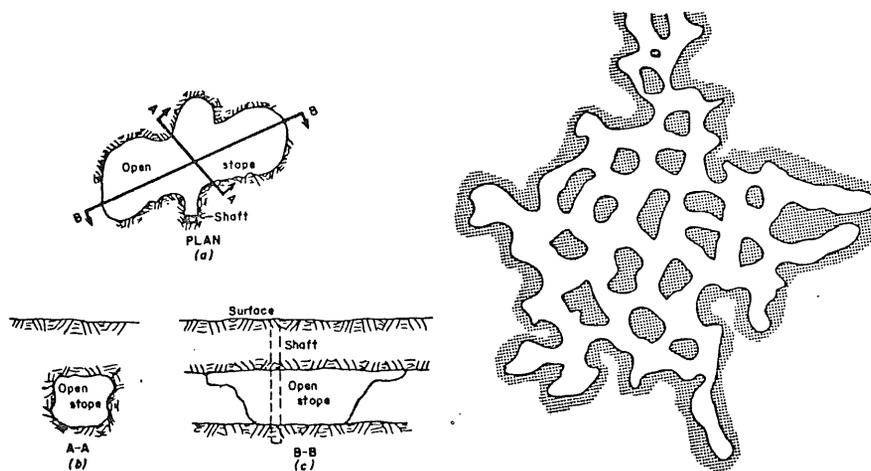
Isolated opening without pillars (Jackson and Gardner). Fig. 9-8—Open stope with random pillars.
